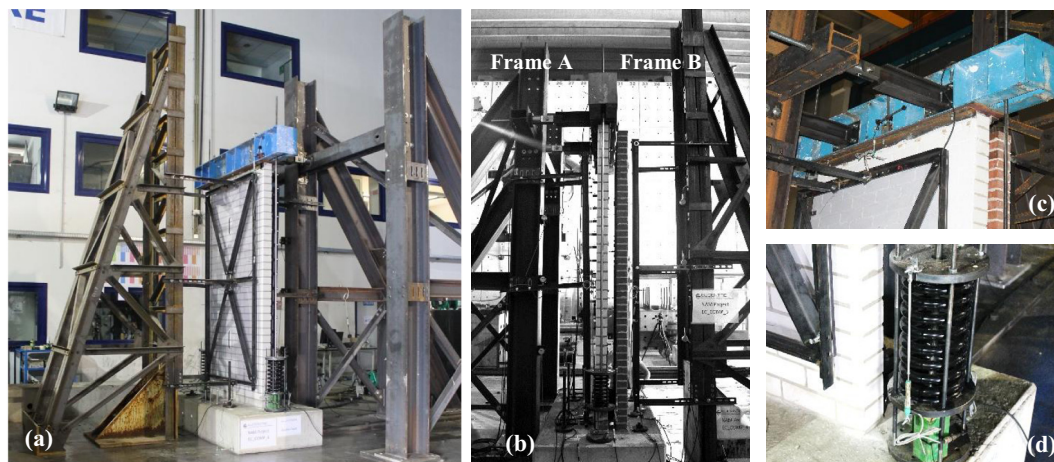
Specimens geometry and details: general view (a, b), top boundary condition (c) and spring system (d).
